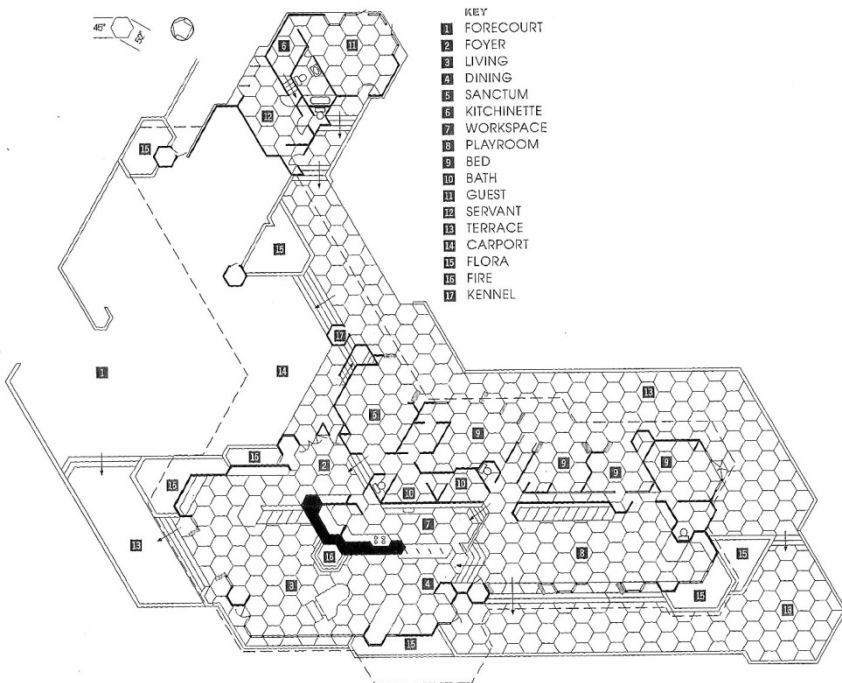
F.L.Wright: Hanna House, Palo Alto, 1936 - ground floor plan
